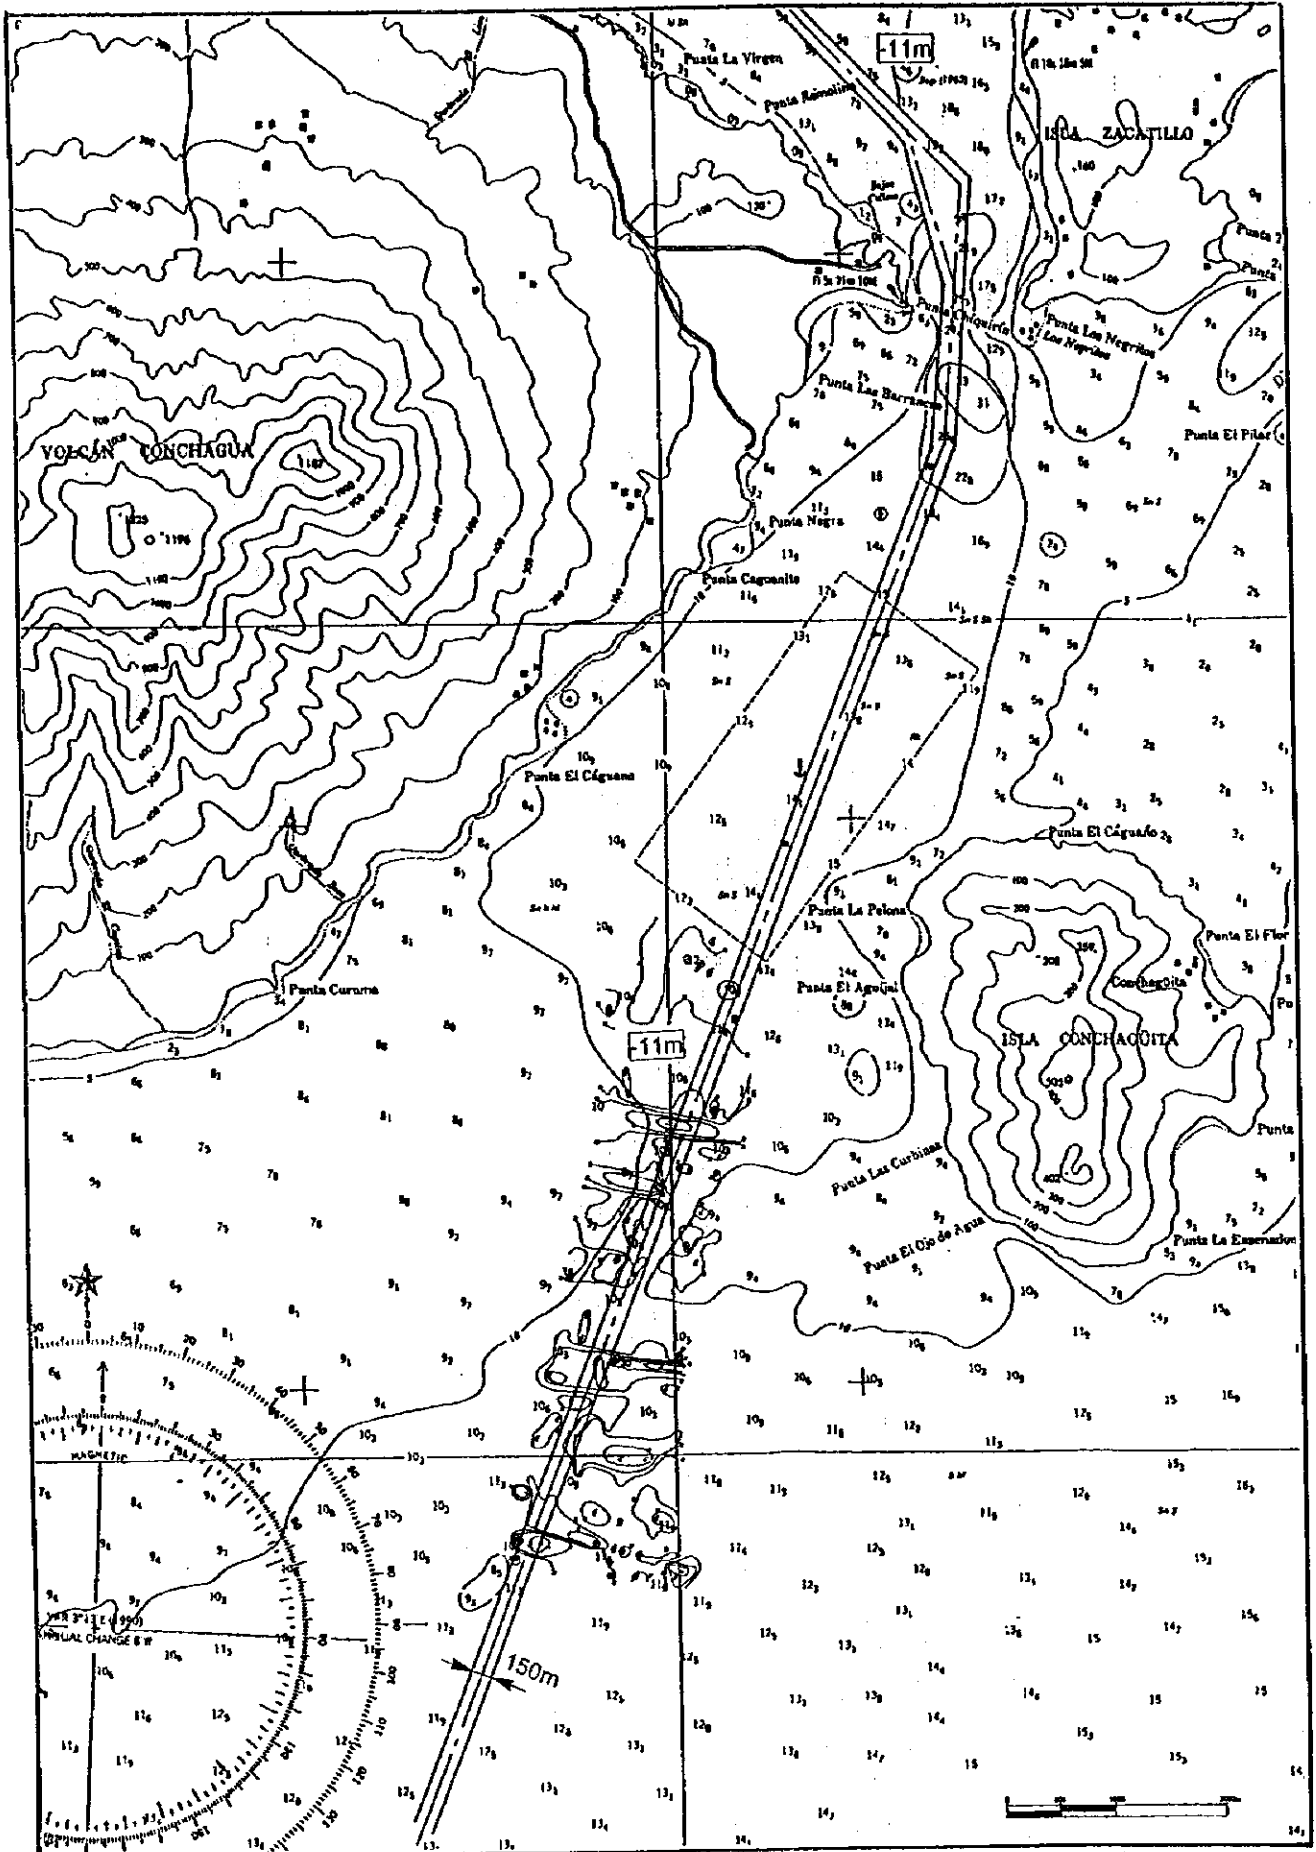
(a) Entire Plan of the Channel (outside the Bay of La Union)
